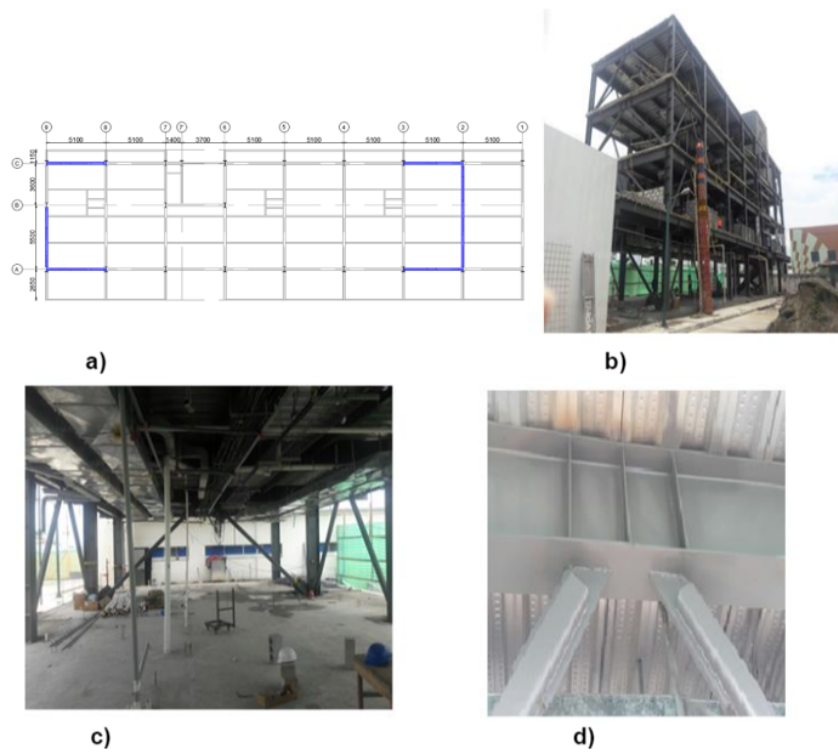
Seismic reinforcement of the Manta UVC; a) Floor plan view and location of reinforced openings; b) Panoramic view of the structure reinforced with inverted-V concentric diagonals; c) Floor plan view showing the columns without concrete and their direction; d) Stiffeners in the beam and diagonals. Source: (Aguiar et al., 2017)
